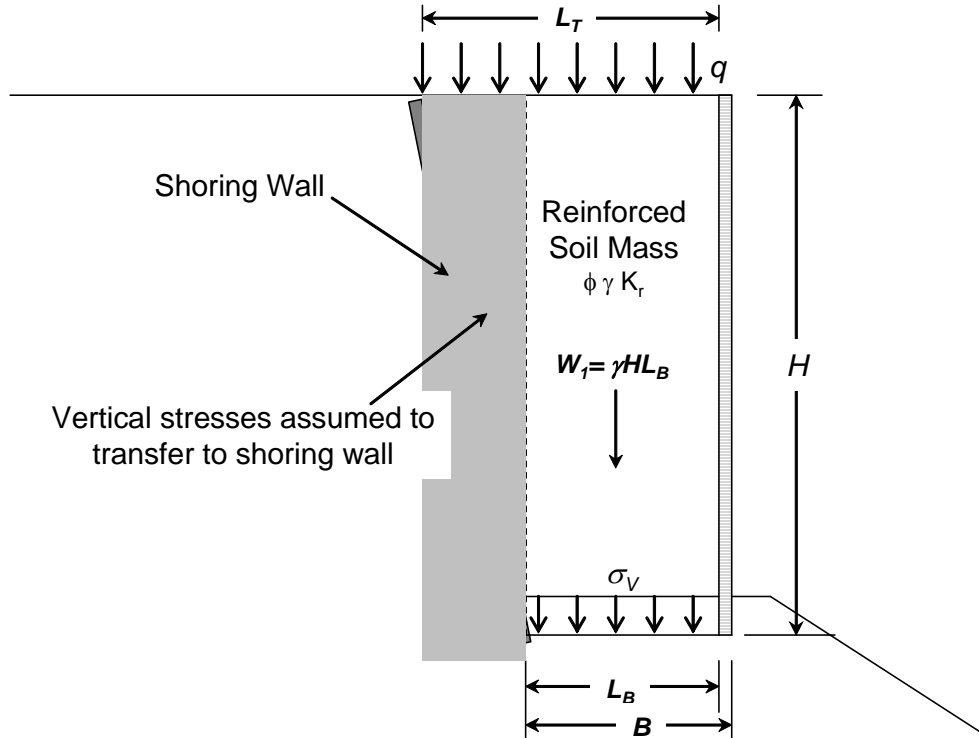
Diagram. Calculation of vertical stress at foundation level.
